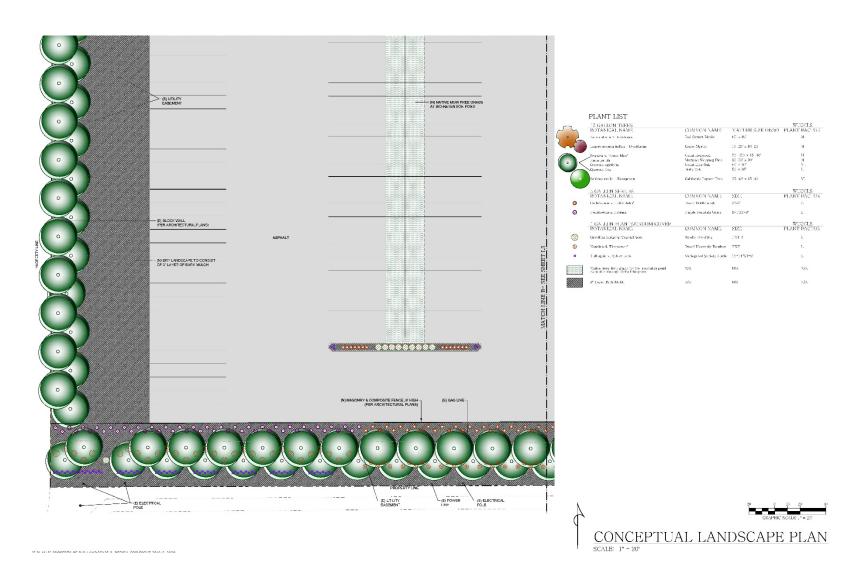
LANDSCAPING PLAN (WEST PROPERTY LINE)
